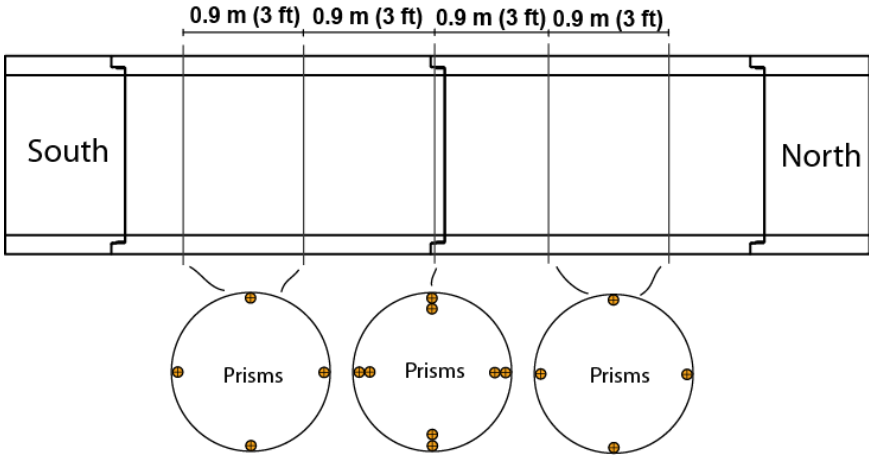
Location of reflective prisms in the 48 in (1220mm) diameter reinforced concrete pipe.
